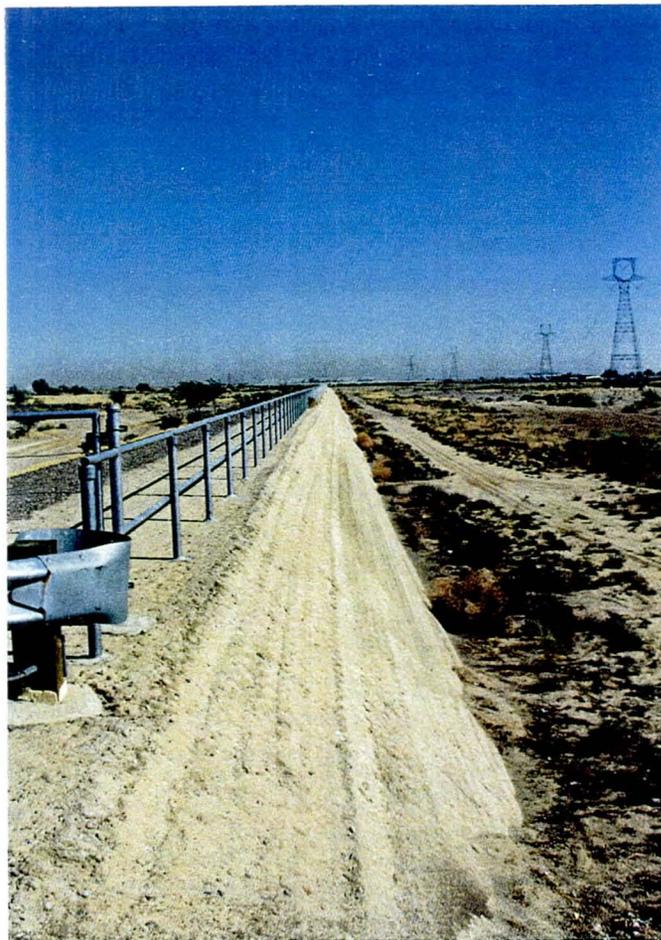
The bank protection (levee) runs from Lower Buckeye Road to Indian School Road.
